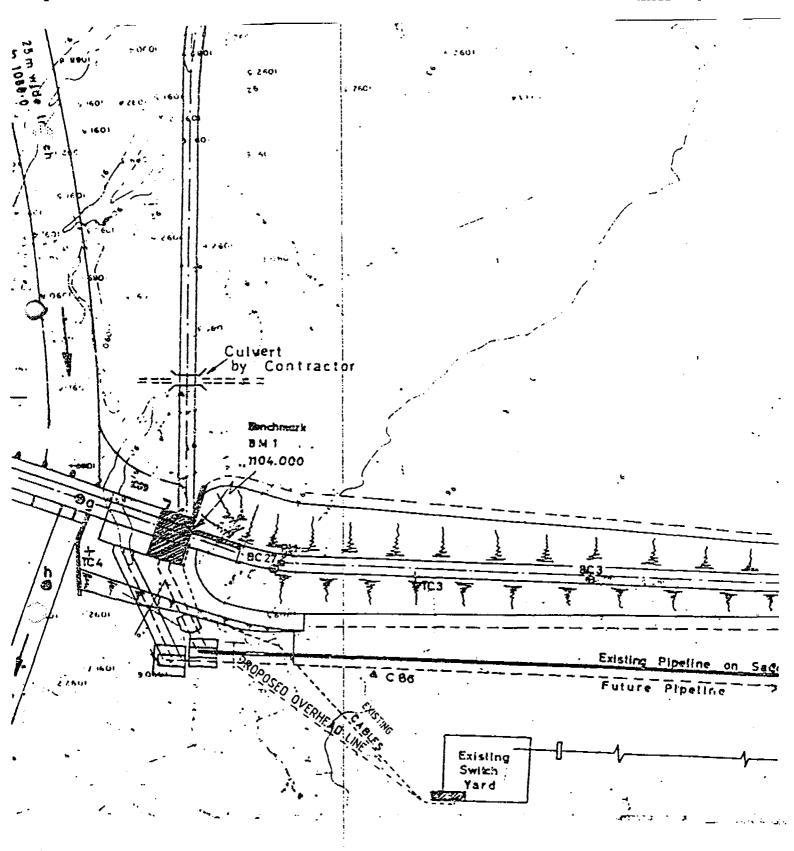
LOCATION PLAN OF CALUEOUE PUMPSTATION
